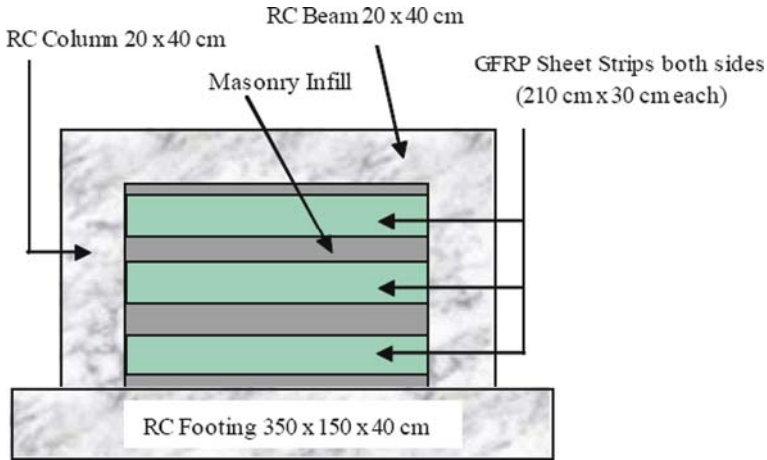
GFRP strips applied to masonry infill wall (see also Fig. 6.9 on page 120)
